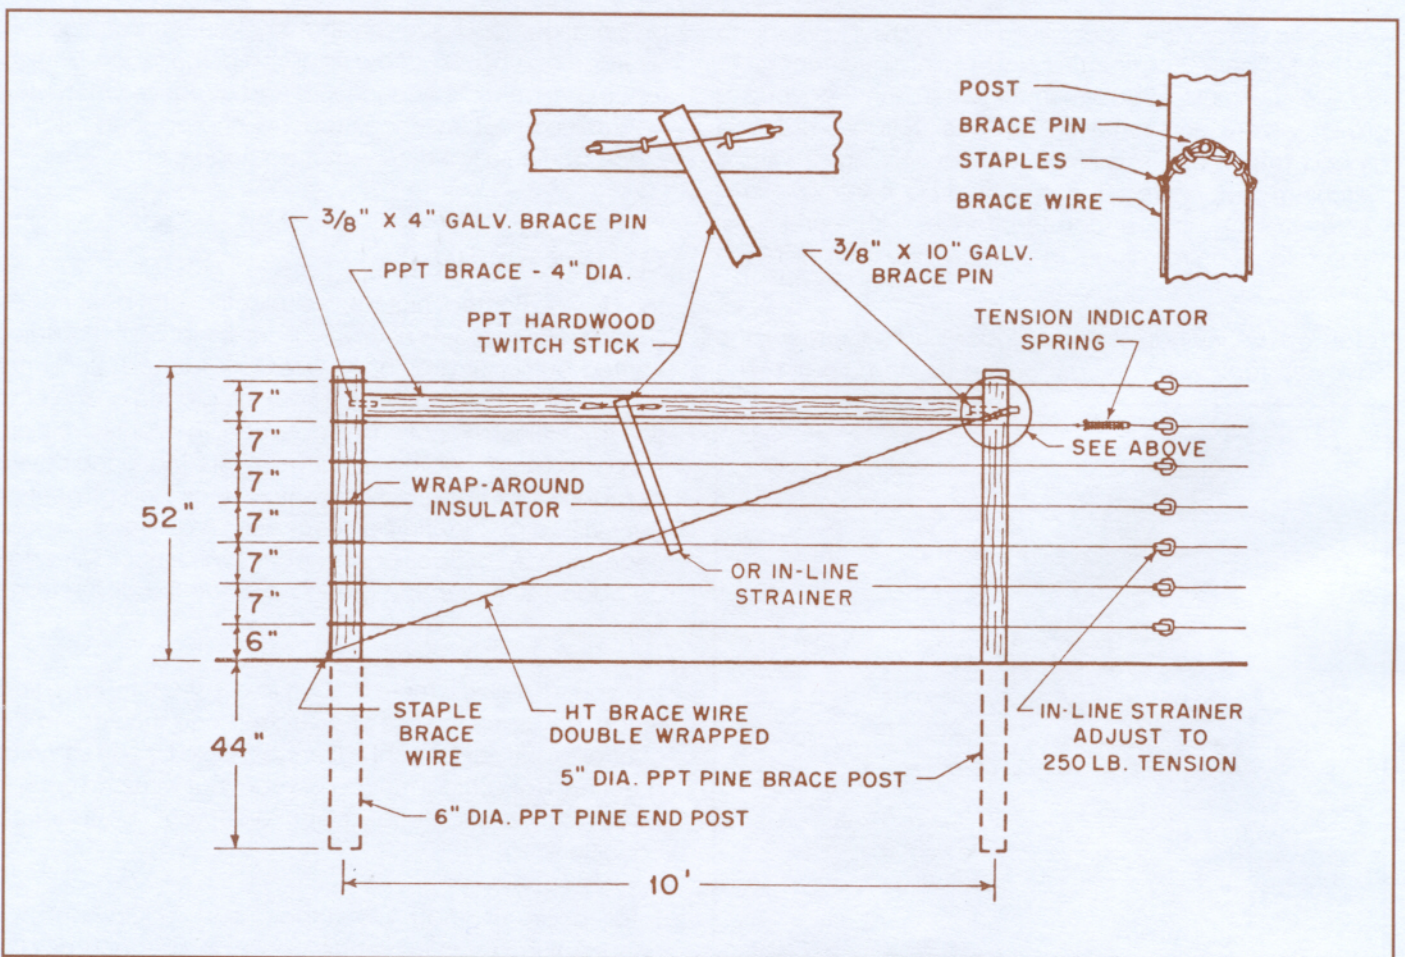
Horizontal Brace Assembly Details For 7-Wire Slanted Fence
